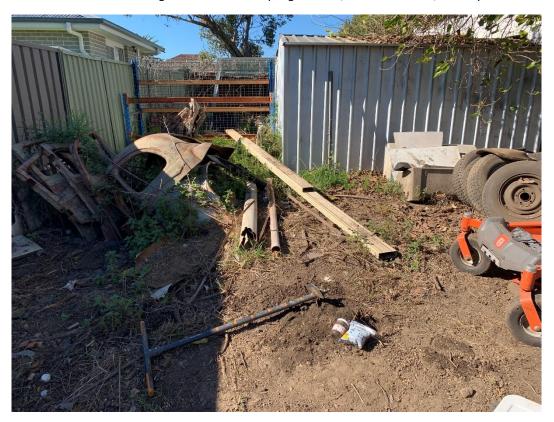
Showing borehole BH6 sampling location, 42 Mamre Road, St Marys, looking east.
